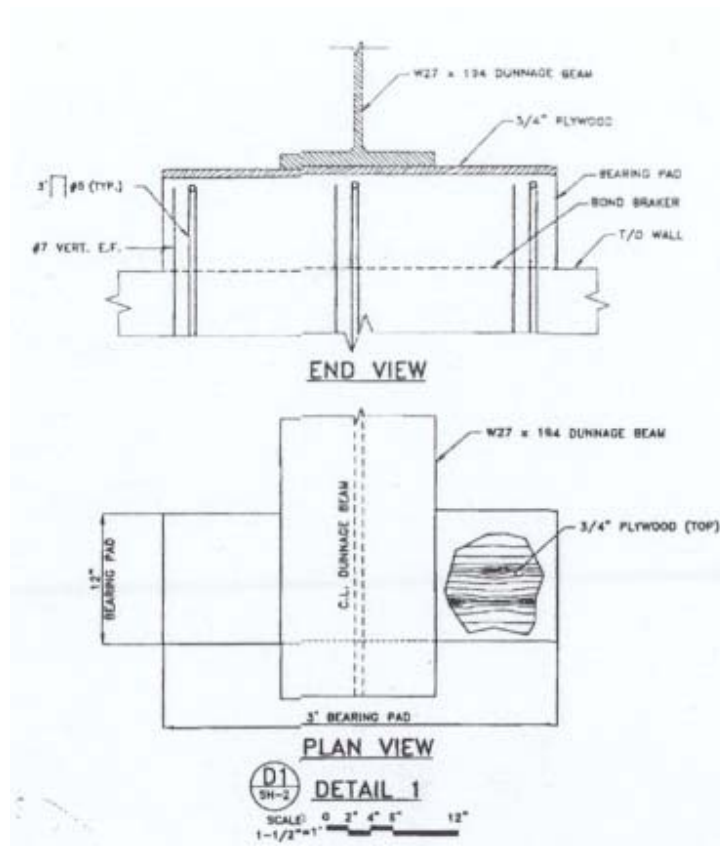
Foundation of tower crane – Detail 1 (source: Drawing 07-046C-1, drawing 2 of 4 dated 1/2/08, submitted by the tower crane engineer (Stroh Engineering) as part of the application for a Certificate of On-Site Inspection).
